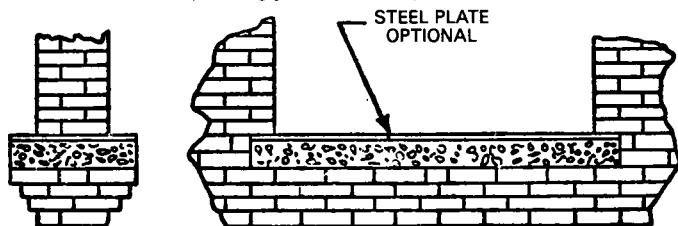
Concrete sill supported by a corbel of brick used with combustible floors.
